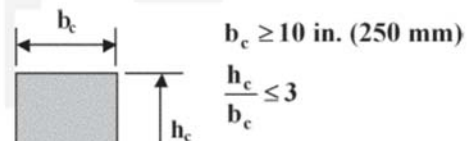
Minimum cross-sectional dimensions for rectangular columns.
